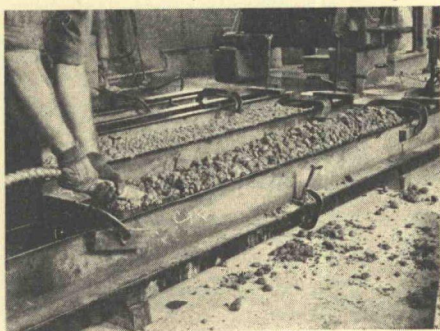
Vibrator Ready to Compact No-Slump Concrete in Beam J15
